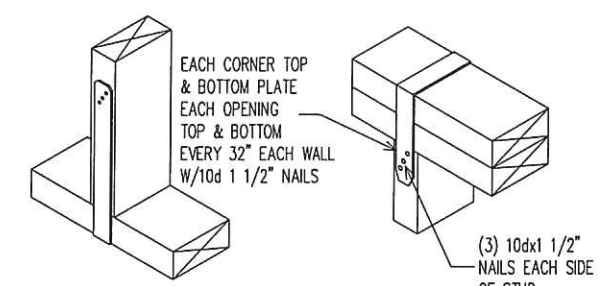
DETAIL "B" WALL SECTION FOR 120 WINDLOAD
